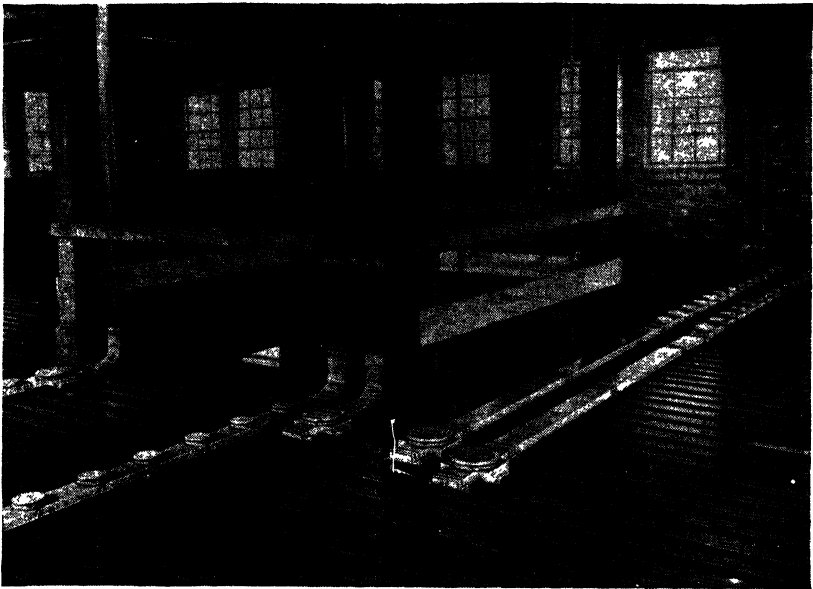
An Installation of Cellular Steel Floors Before Concrete Surface Has Been Poured.
